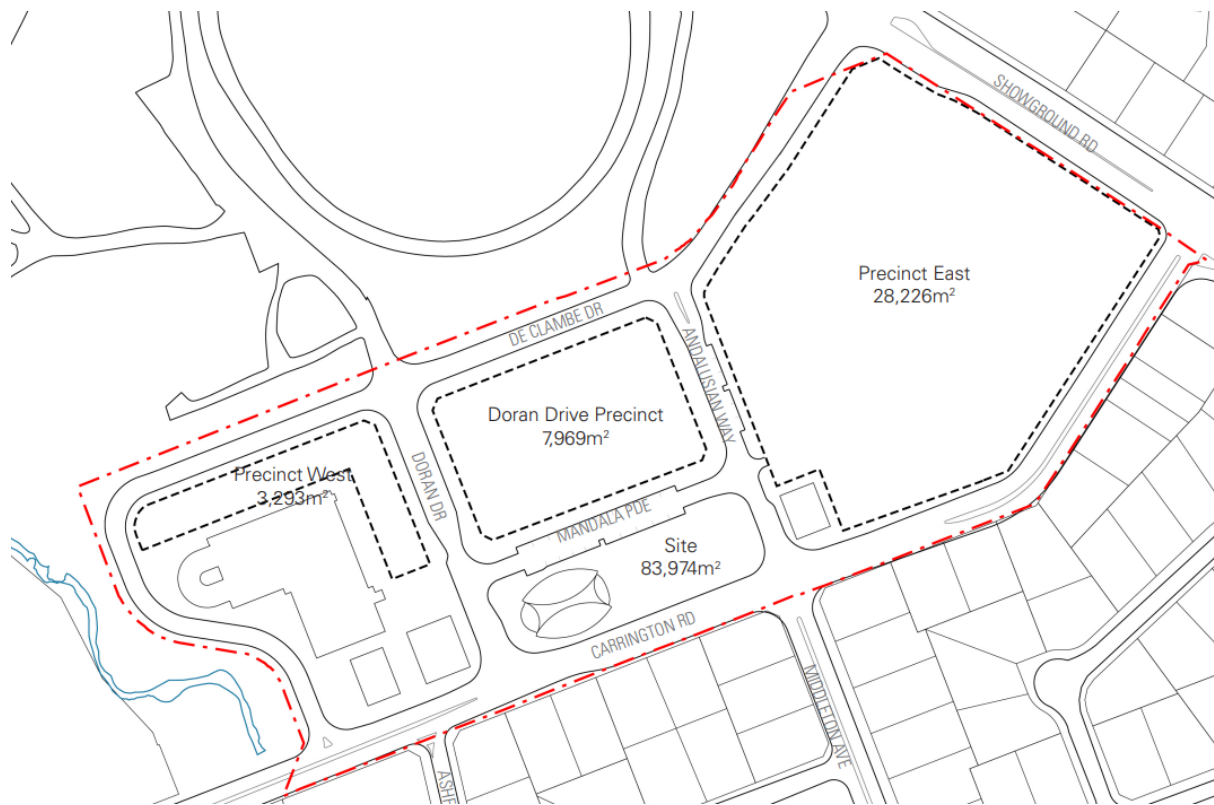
| Site and Development Lot Plan (Source: Hills Showground Station Precinct SSD EIS)
